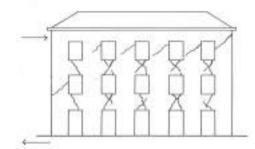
From G. Croci, Conservazione e restauro strutturale dei beni architettonici, Utet, Torino 2011.
